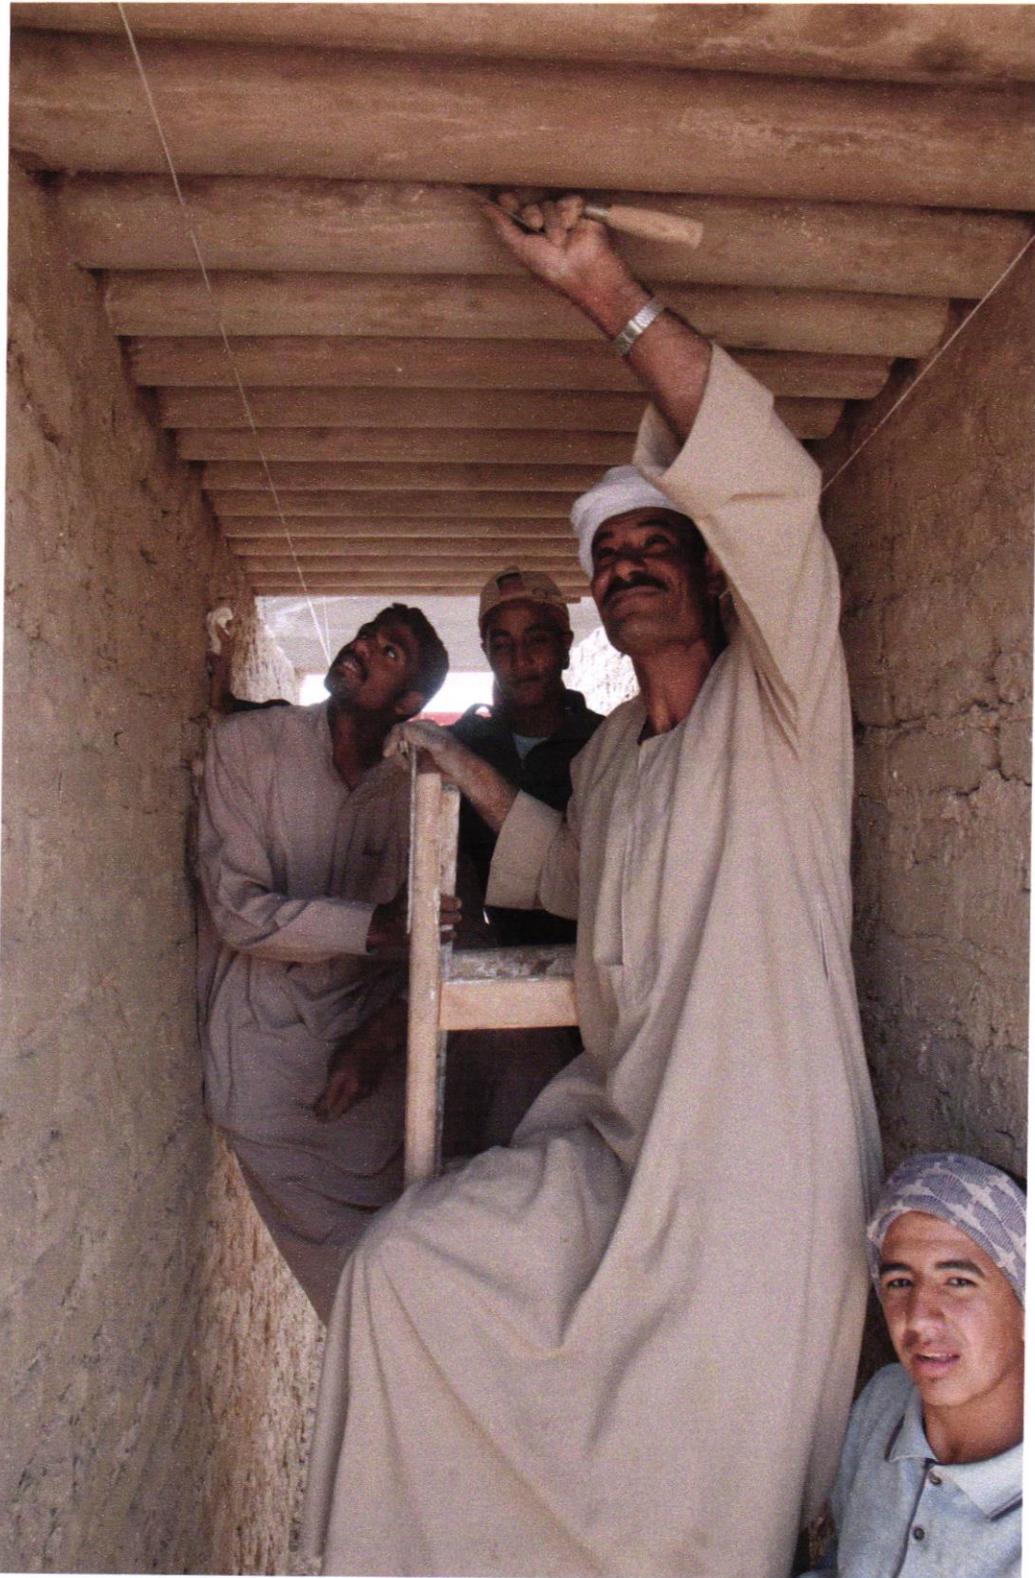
The underside of the “pole” roof of the gateway, during construction. The underside of each seam was carefully pointed.
